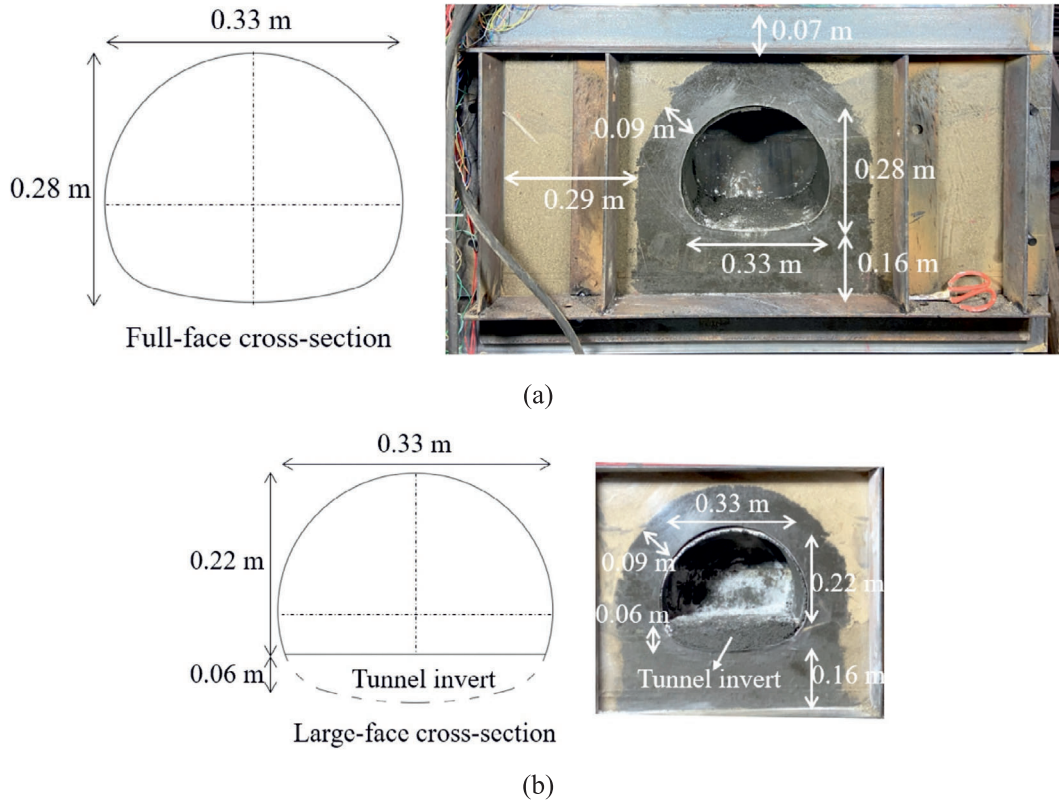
Tunnel cross-section. (a) Full-face excavation, and (b) large-face excavation.
